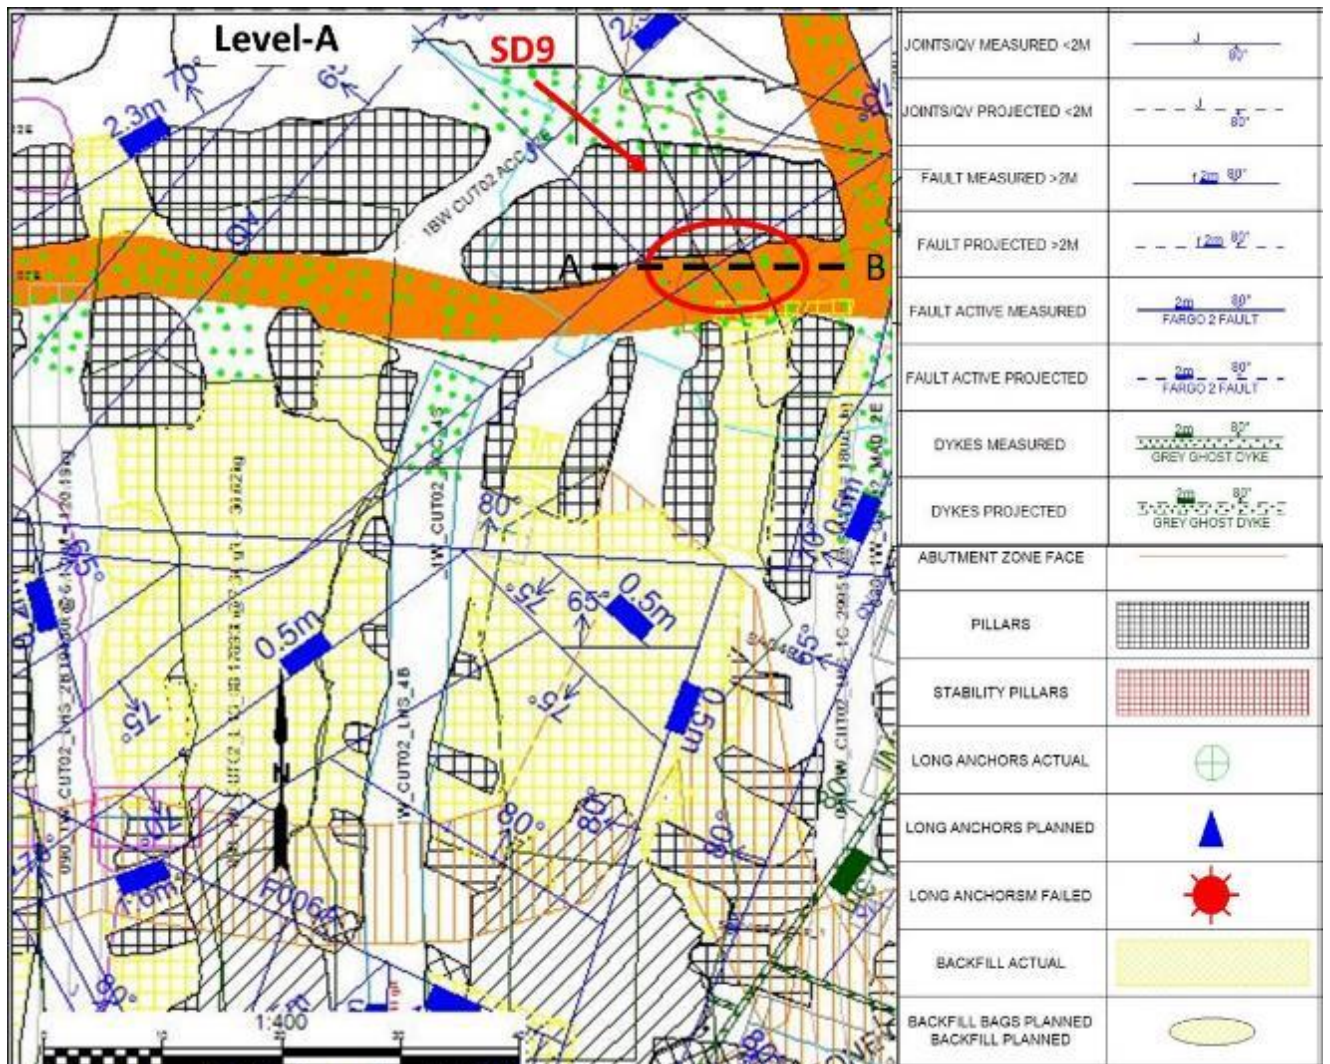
Level-A 1W CUT02 plan showing SD9 sampling point.
